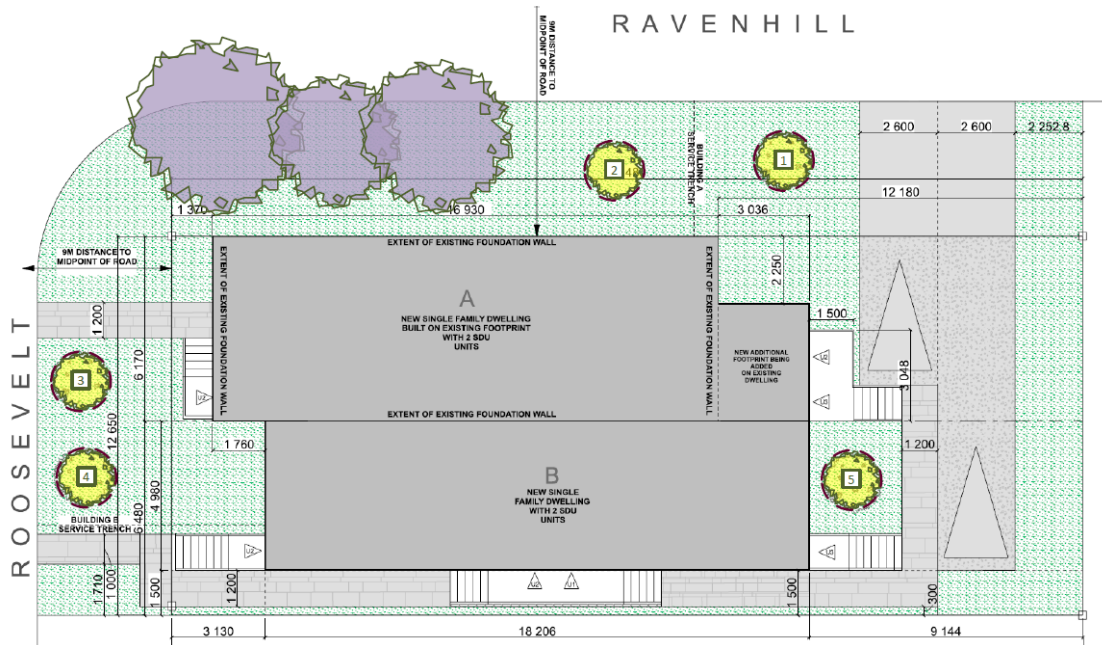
Tree Planting Plan, prepared by Drendon Forestry Services
